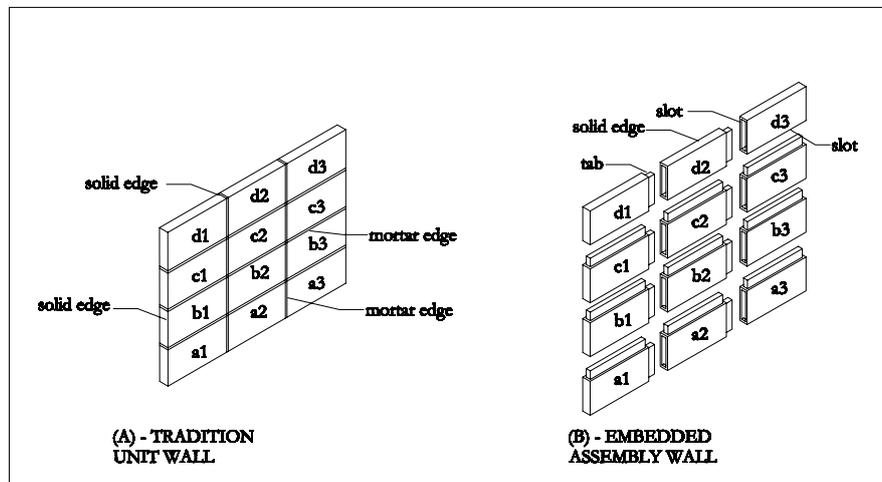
(A) Traditional wall with mortar joints between blocks (B) wall with embedded assemblies
